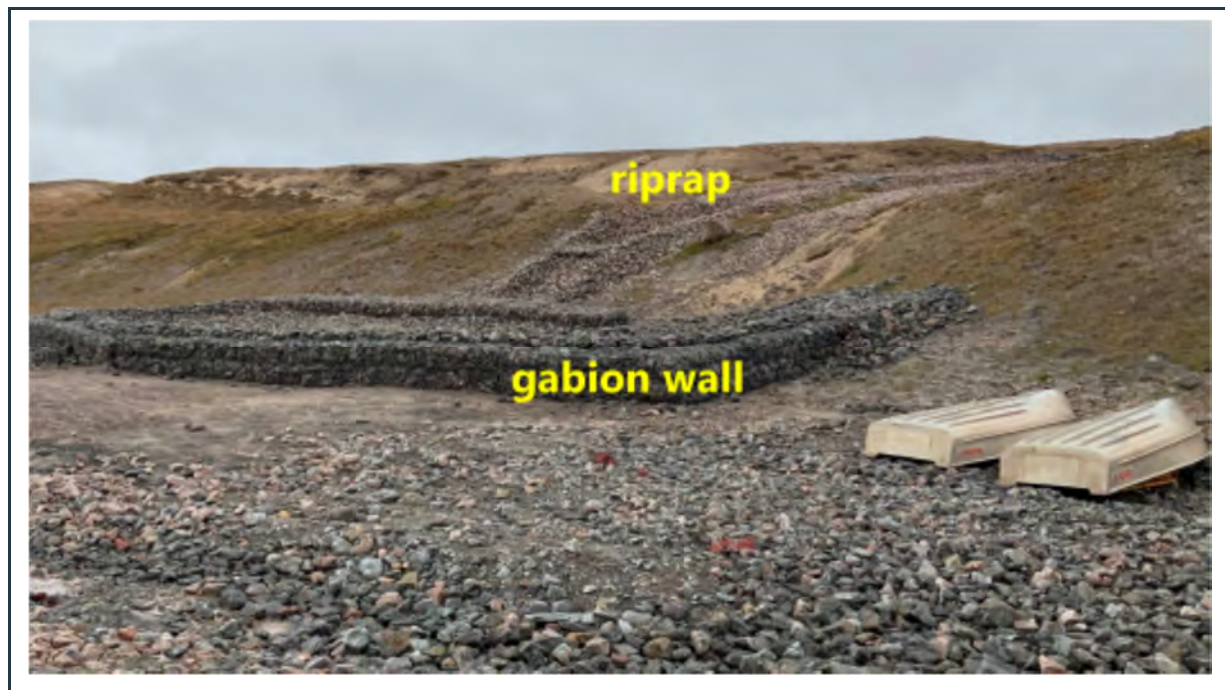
View of the new gabion wall and riprap adjacent to Camp Lake to capture suspended solids potentially eroding from the airfield area and to prevent siltation in the lake.
